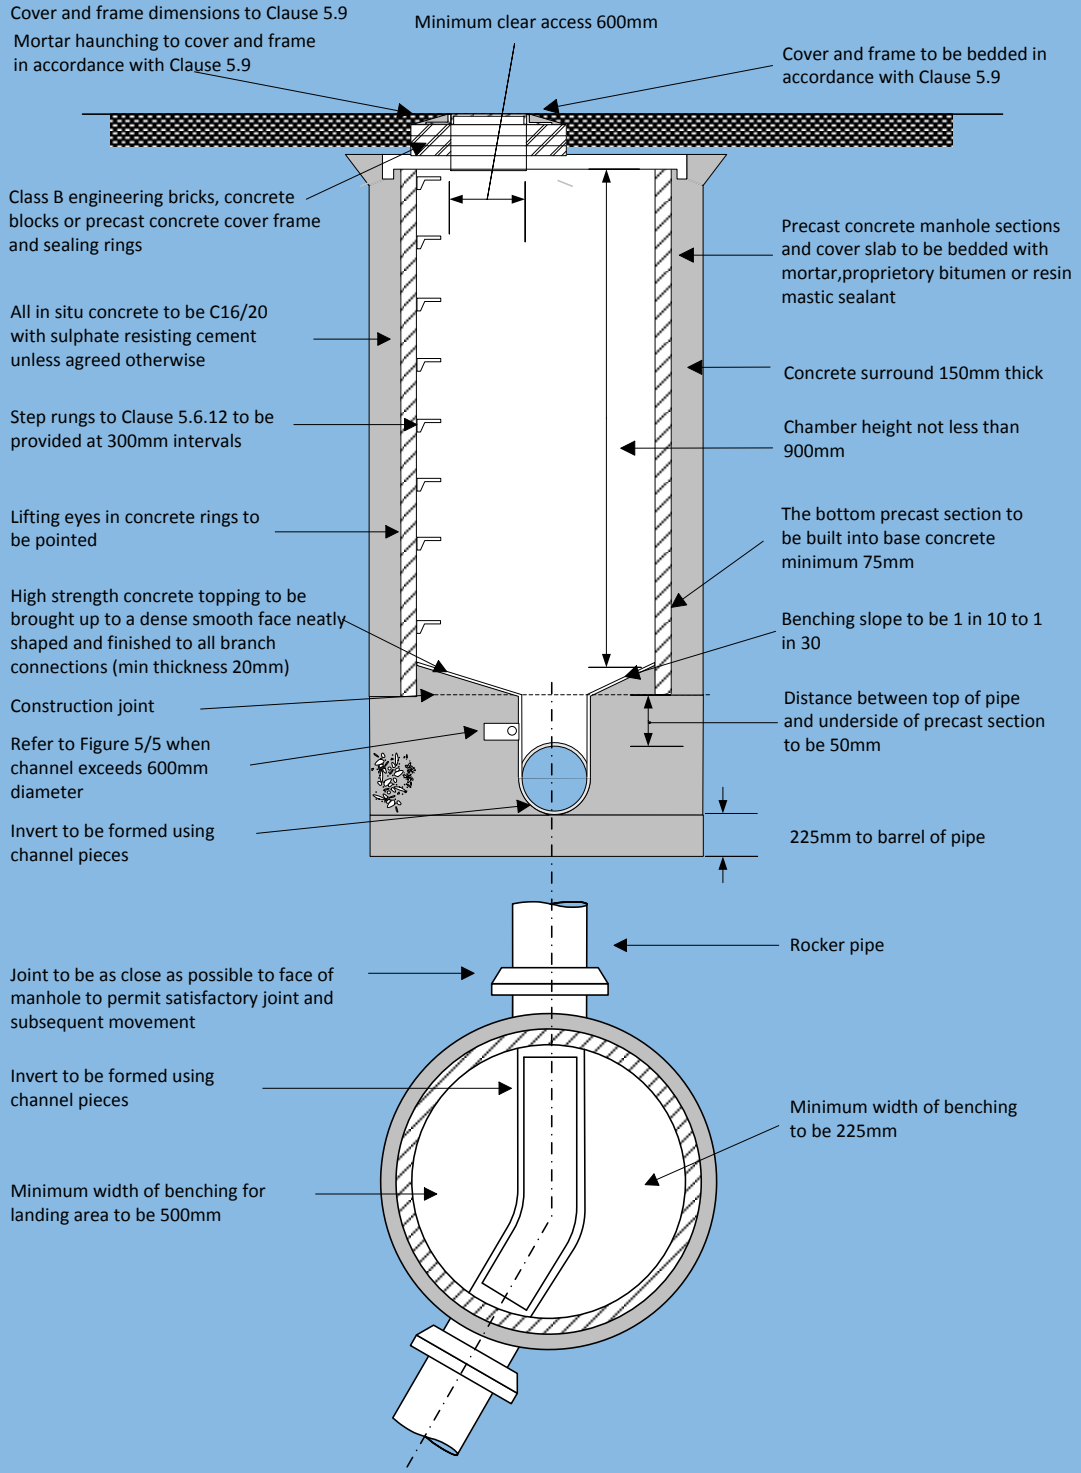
/3 - TYPICAL MANHOLE DETAIL - TYPE C
